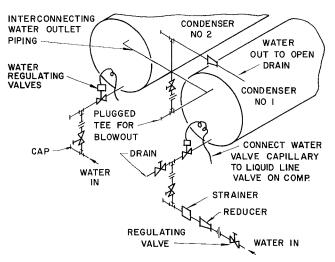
50BJ024 Typical Waste or City Water Piping
